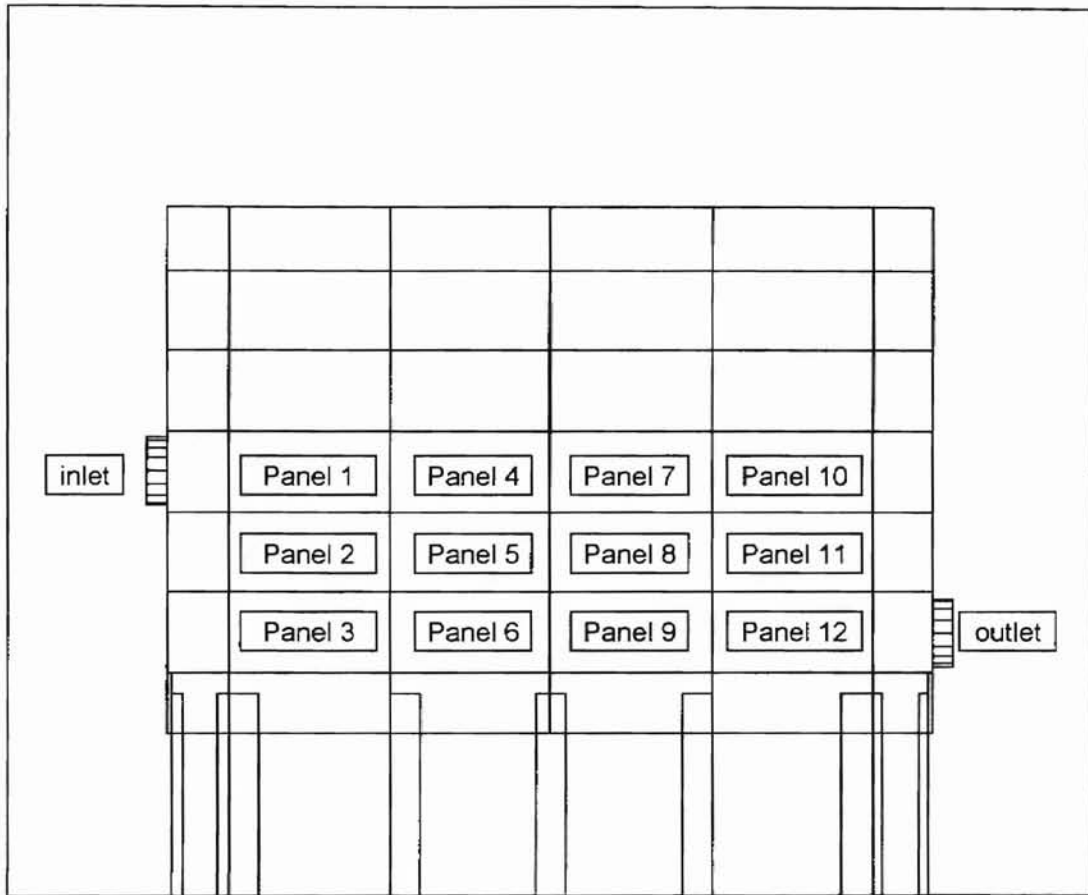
Experimental Room Interior Elevation, Heated Panel Layout
